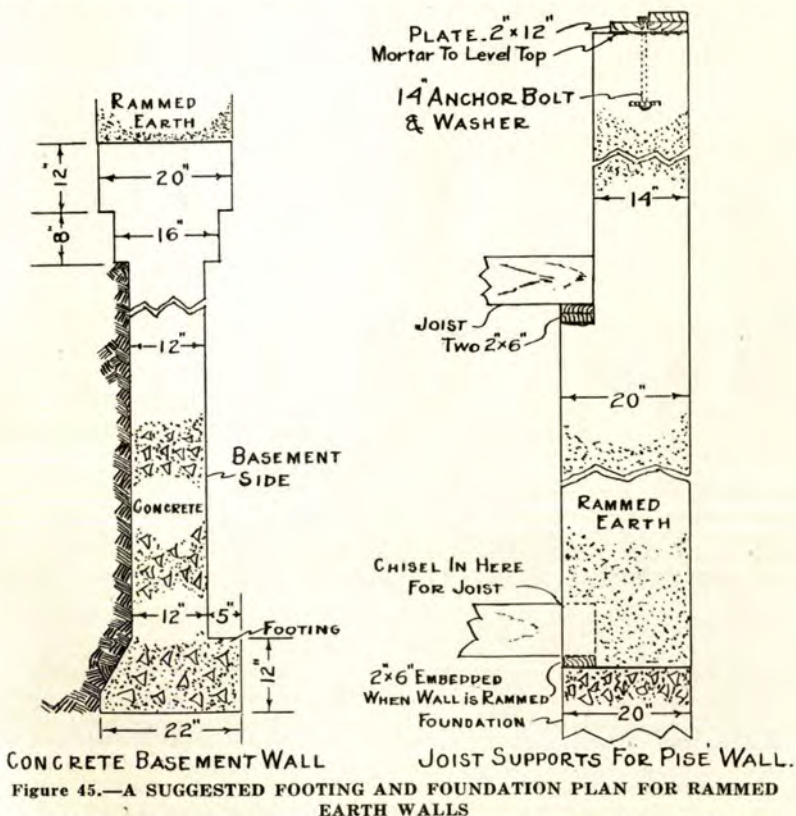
A SUGGESTED FOOTING AND FOUNDATION PLAN FOR RAMMED EARTH WALLS
